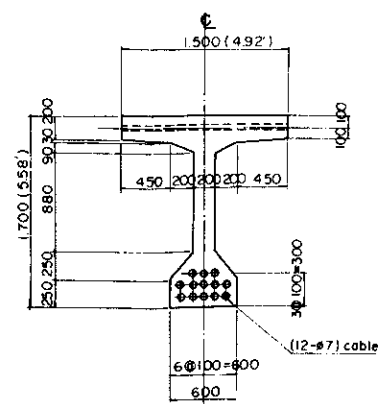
DETAIL SECTION OF OUTSIDE GIRDER Scale 1/30
